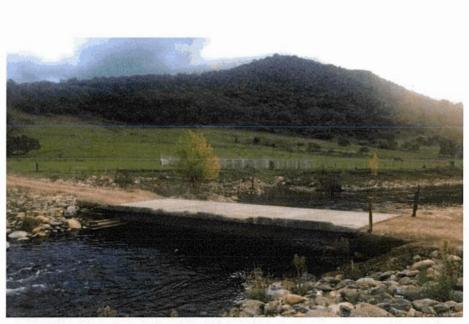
Indicates the steel and concrete bridge that crosses the Goobarragandra River to allow access to the subject site (Bradley Cameron 2019).
